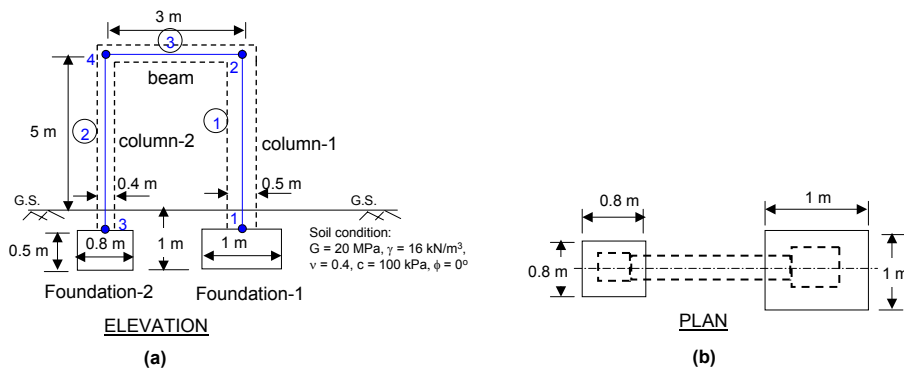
Example 2:(a) Elevation and (b) Plan of the single-bay frame
